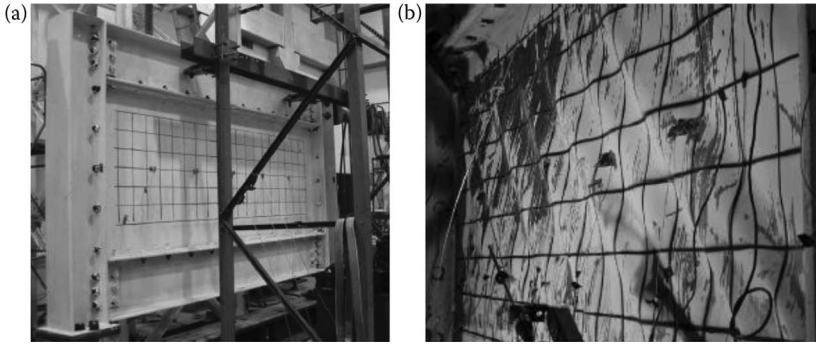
Test on a shear unstiffened steel plate by Bruneau et al. (2005): (a) before test; (b) after test.
